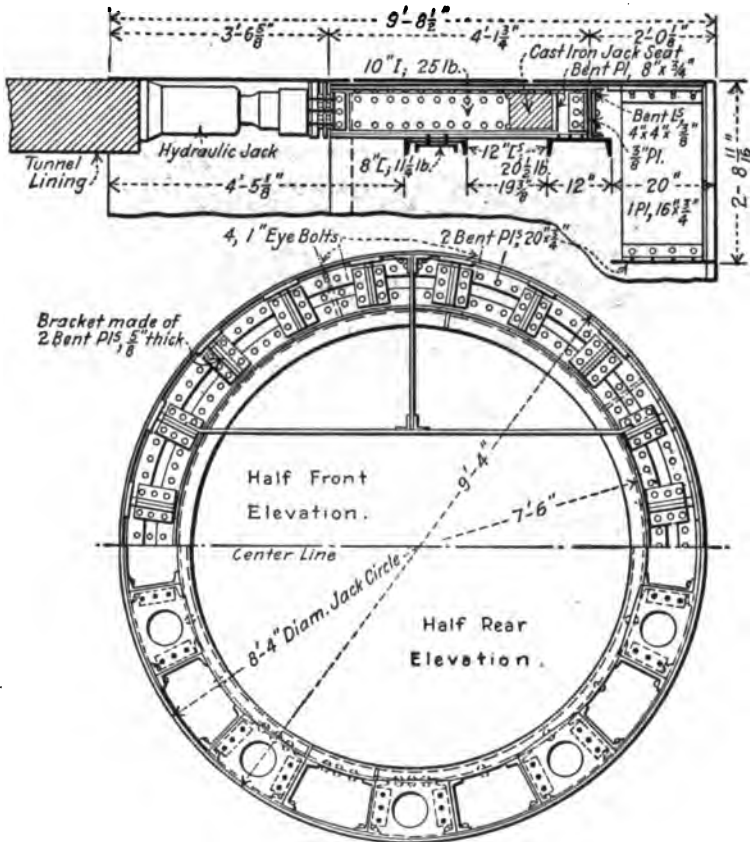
Shield for Driving Milwaukee Sewer Tunnel.
